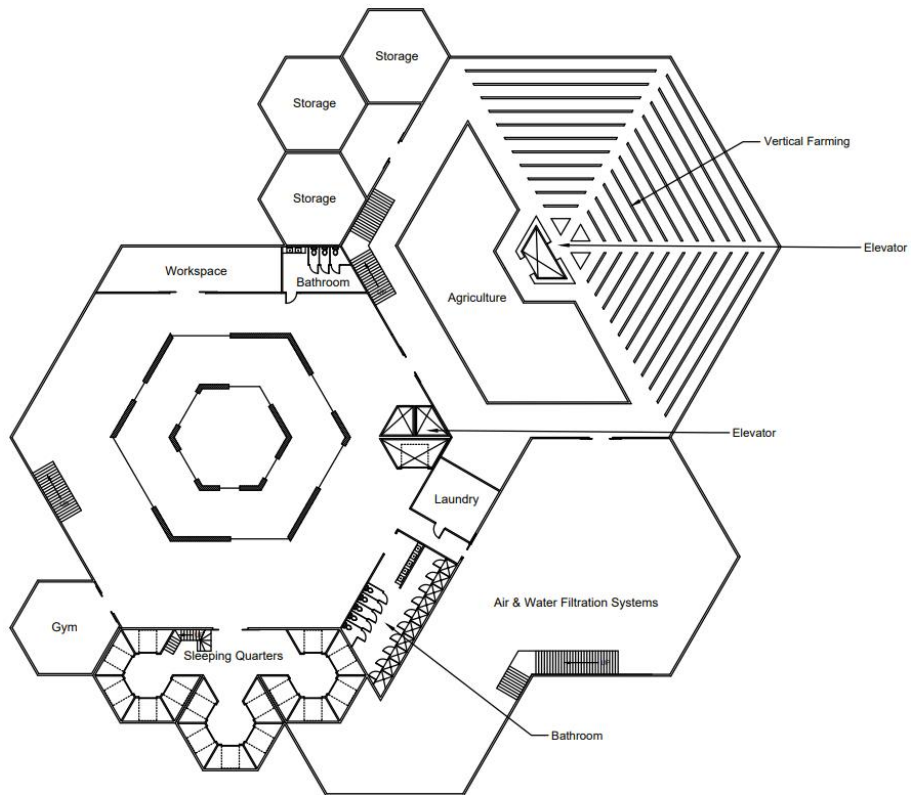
Floor plan of the B2 level of the lunar base (underground).
